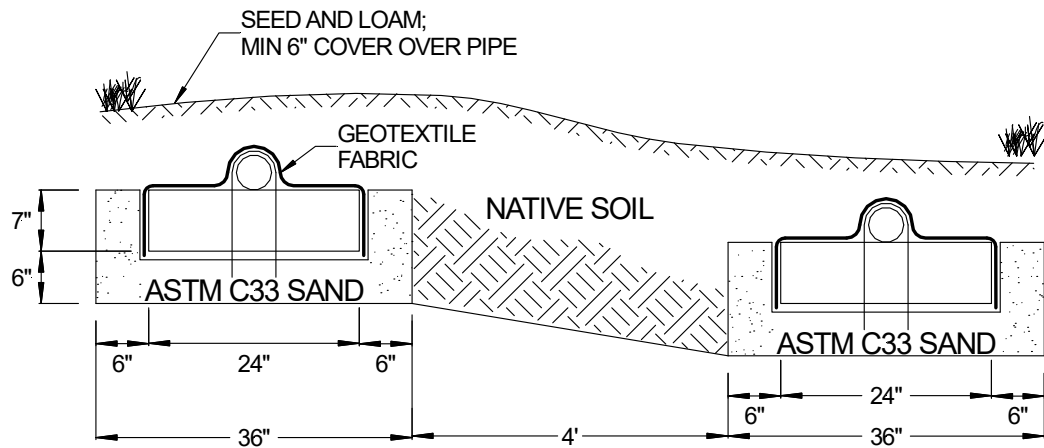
SECTION VIEW – TRENCH SYSTEM – SLOPING SITE
